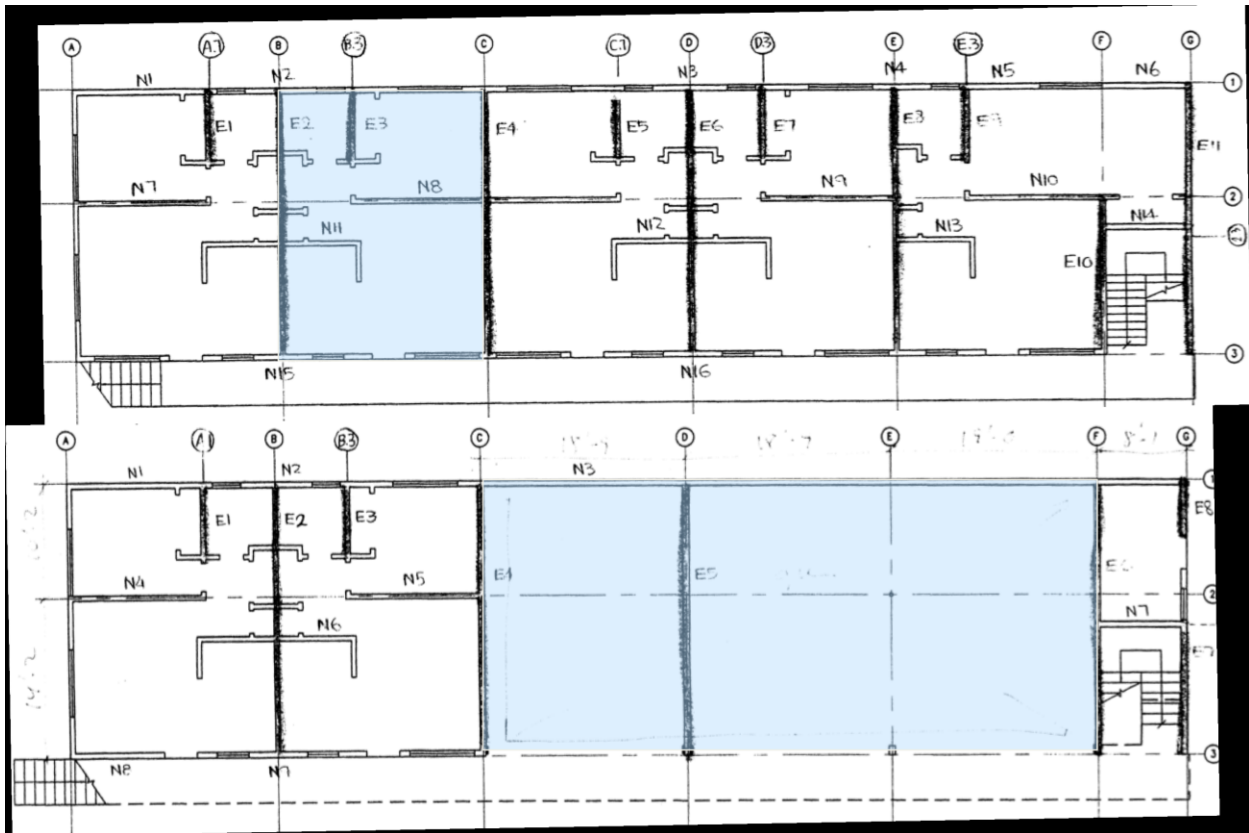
Floor plan of an example Berkeley building found to have a soft-story condition.
